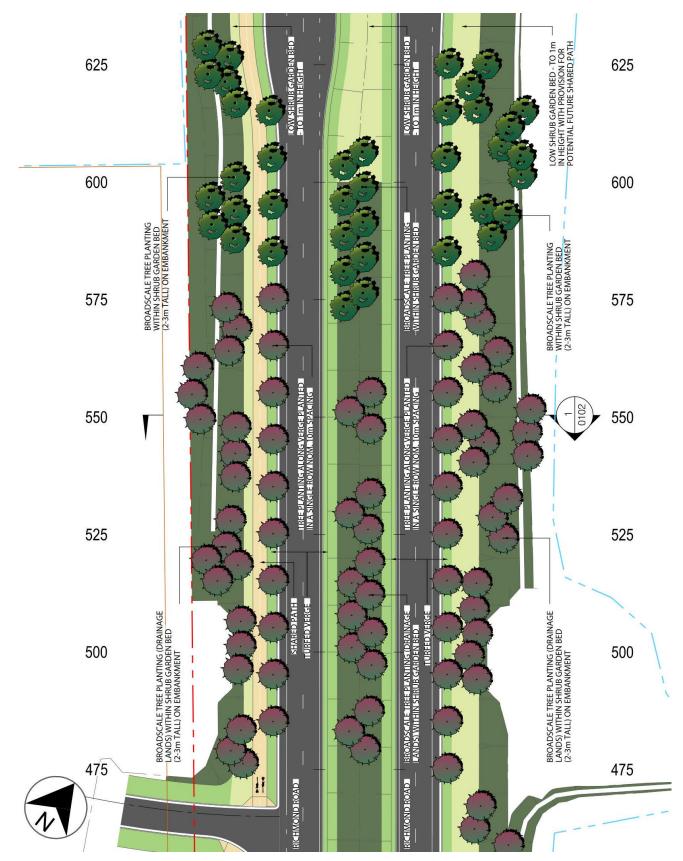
Typical Section of alignment depicting drainage and broadscale planting
